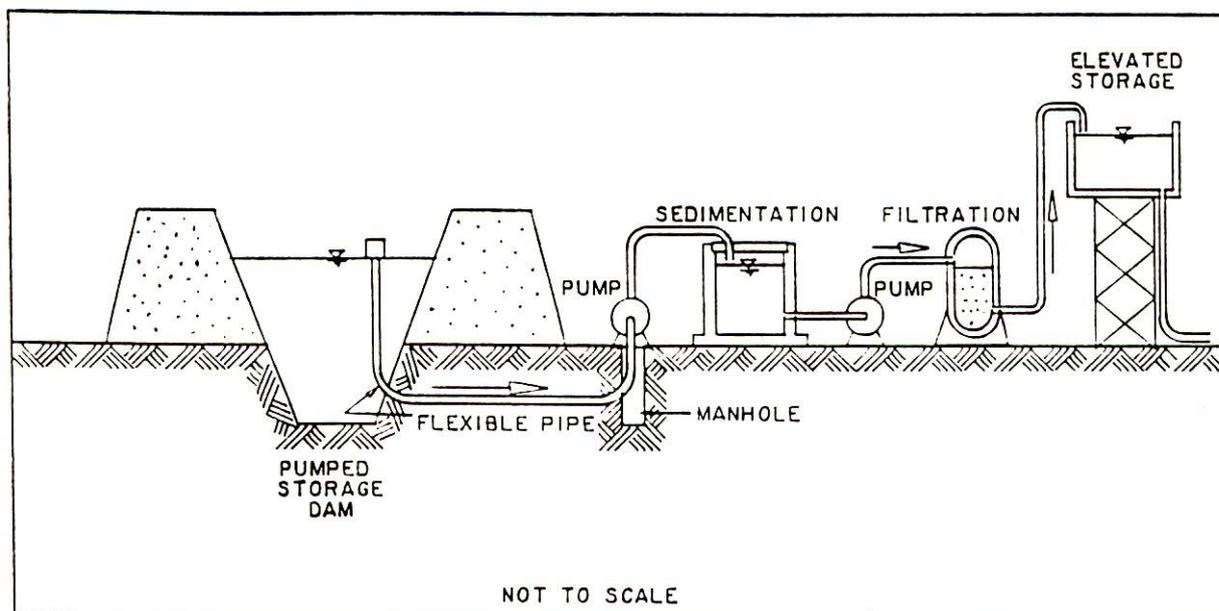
Typical layout of an excavation dam and a pumped storage scheme
